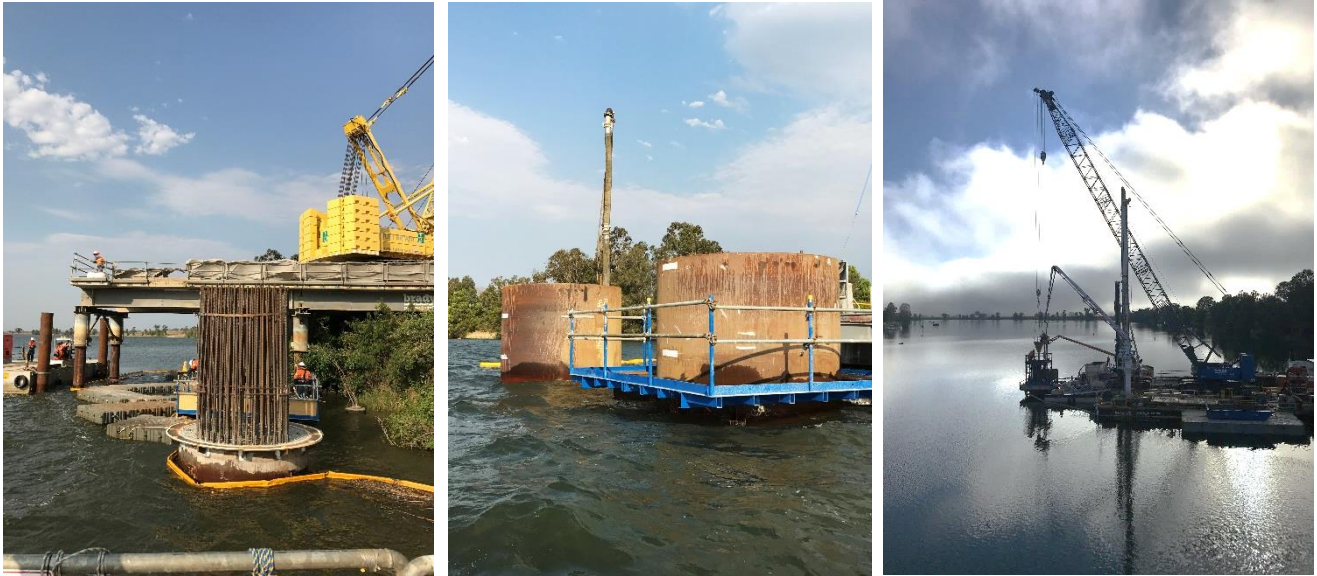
(a) completed pours at Pier 2 in preparation for pier skirt installation; (b) installed casings for pier 3 and; (c) concrete pump at pier 3
